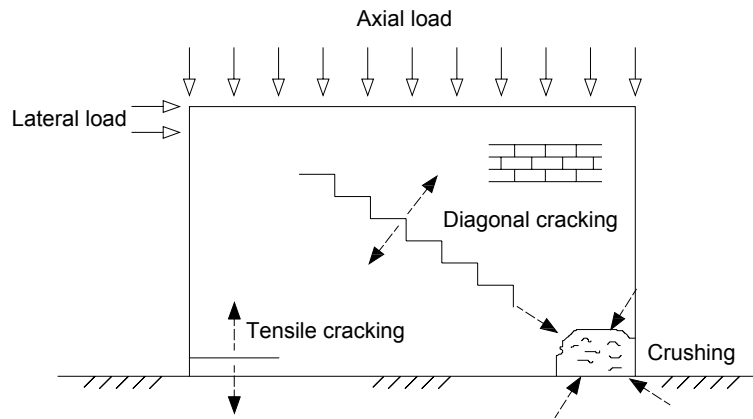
Typical cracking patterns of shear walls.
